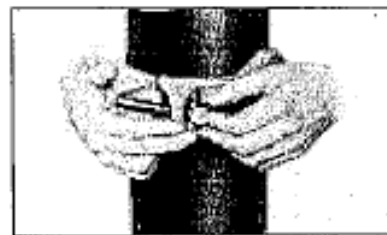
A. Position Mechanical-T Outlet (S/920)
